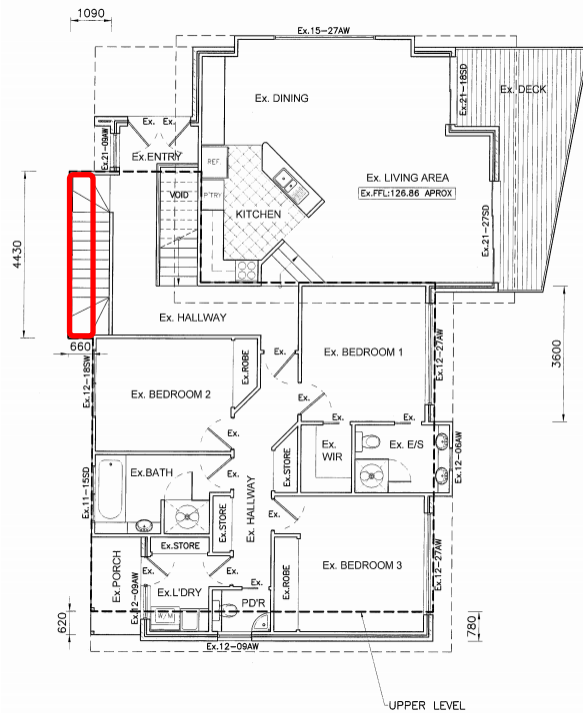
The existing mid level floor plan with proposed staircase leading to the proposed upper storey addition (red highlight indicates portion of the staircase being outside the existing building setback).
